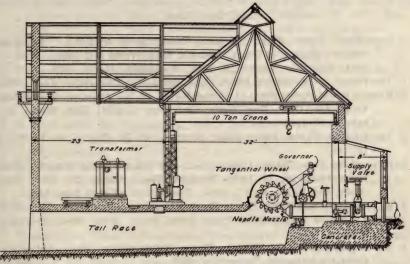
Plant of Nevada Power Mining and Milling Co. (Engineering Record).
